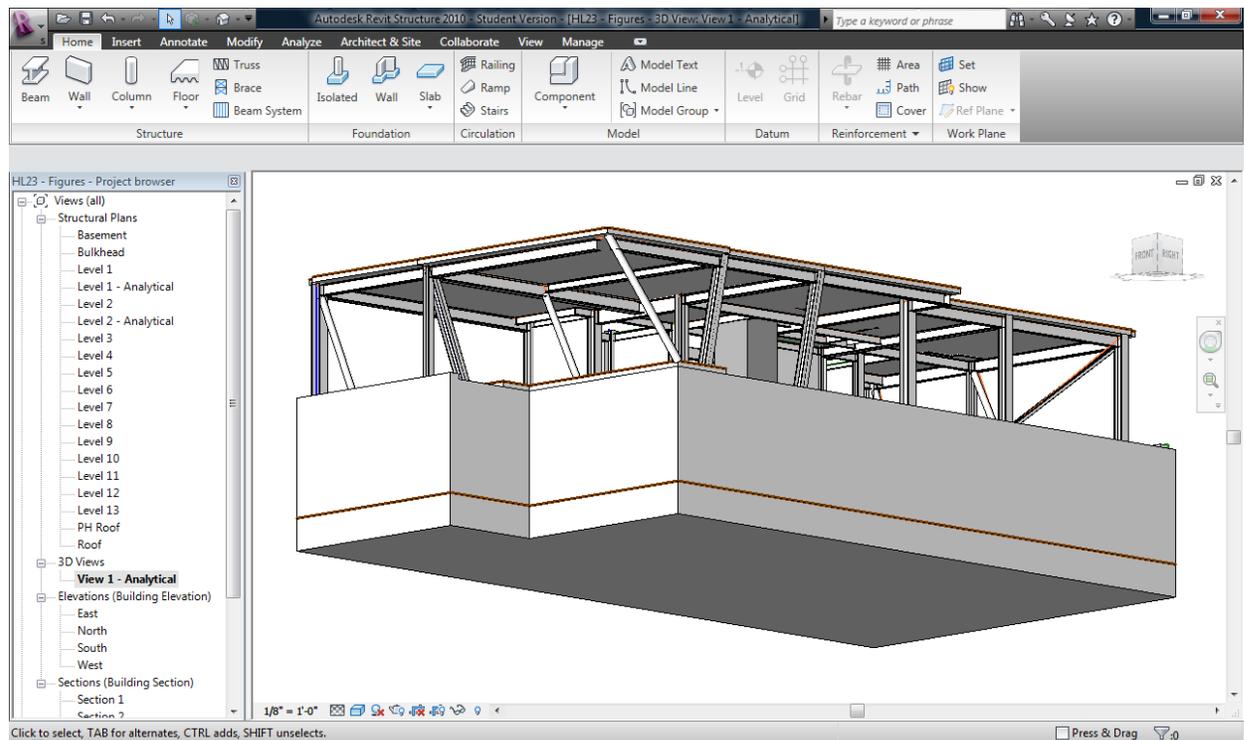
A 3D View of a Mat Foundation and Foundation Walls
